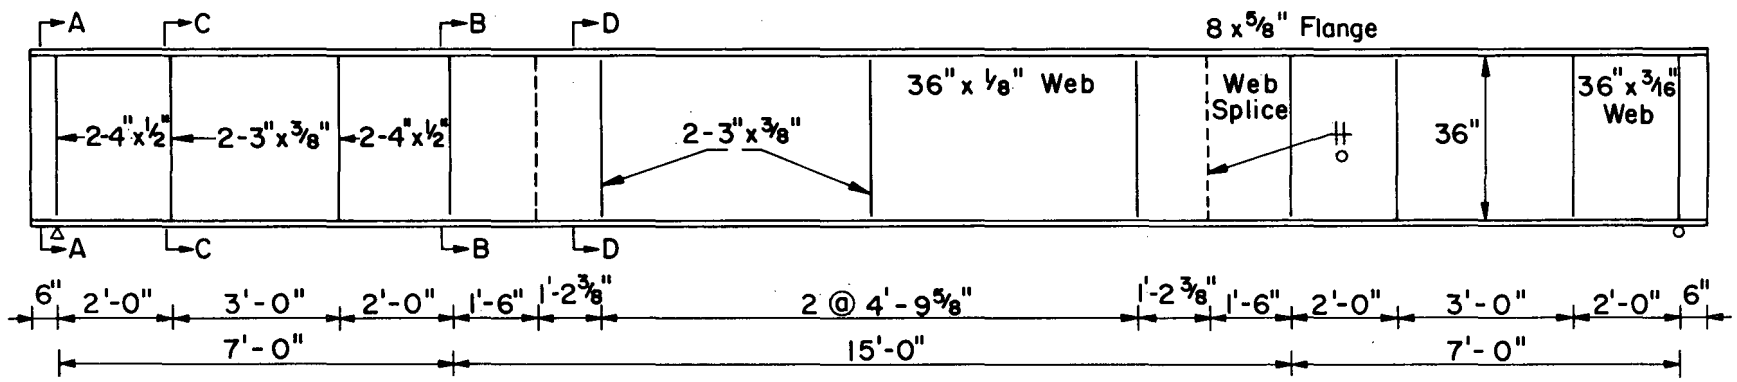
Girder EG-3 and Sections AA, BB, CC, and DD for All Girders
